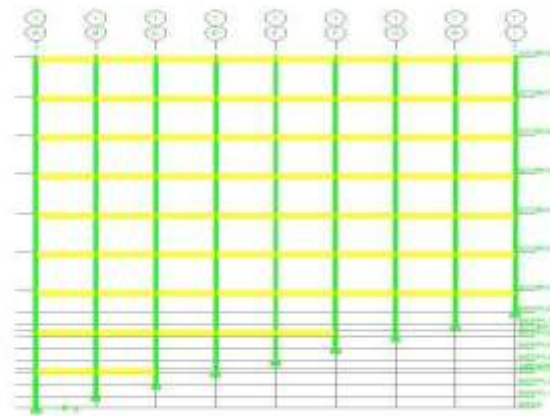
Elevation of step back building for eight storey model (150 slope)
